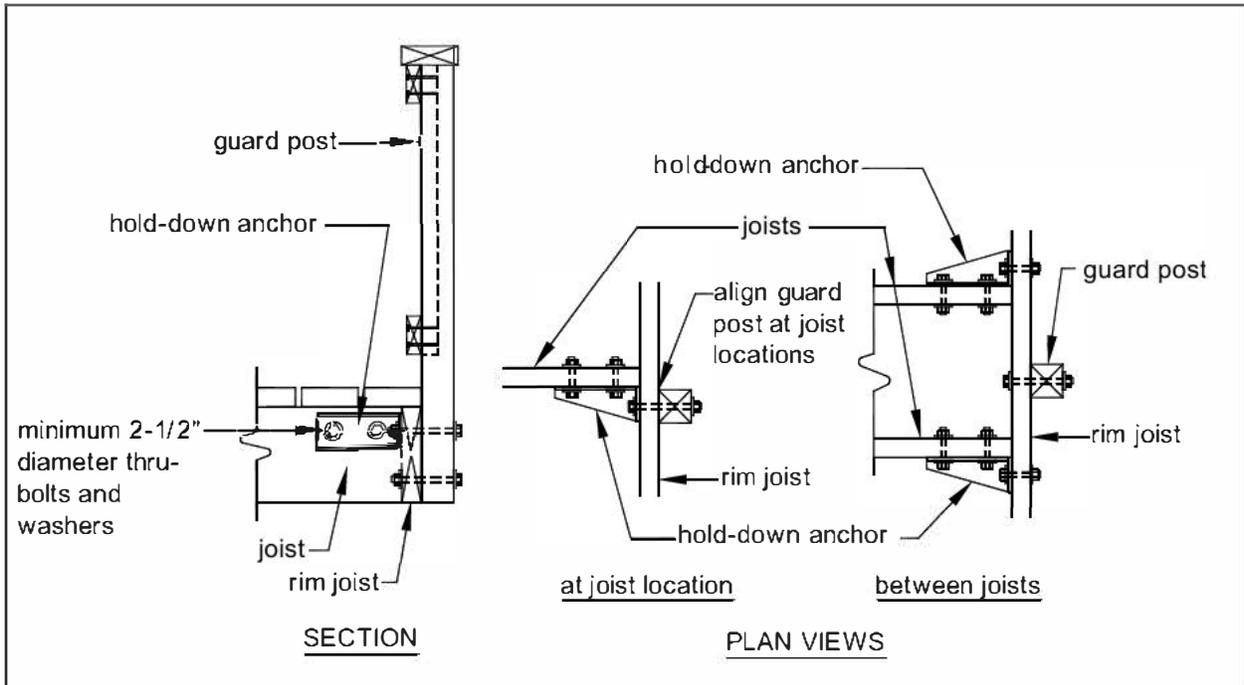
GUARD POST TO RIM JOIST DETAIL, OPTION 2
